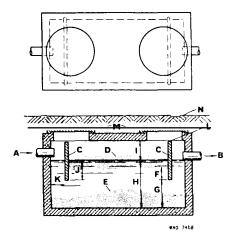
TYPICAL LAYOUT OF SEPTIC TANK SYSTEM
